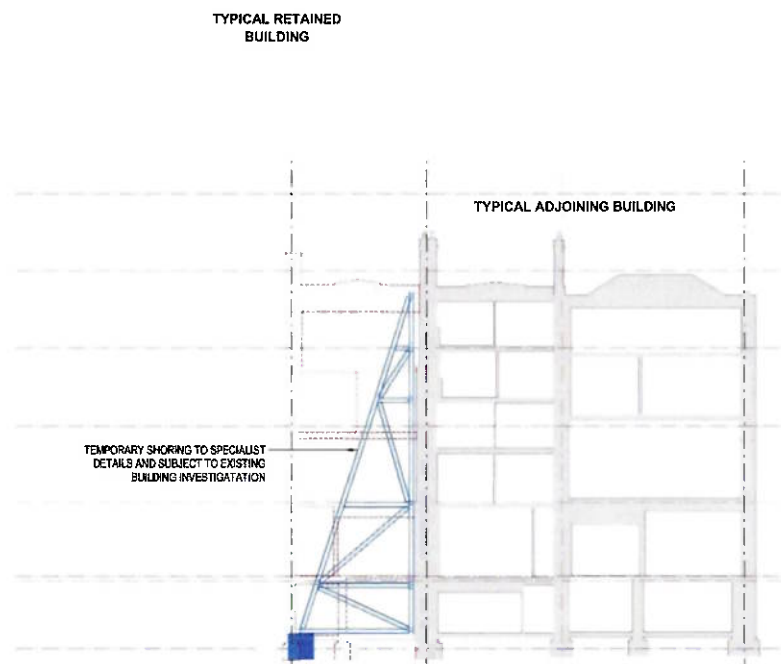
34 Henry Street Temporary Boundary/Adjoining Retention System
